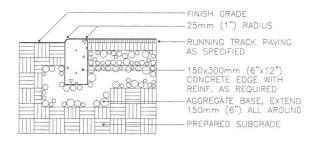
Concrete grade beam for running track. Reinforced concrete track edge restraint. Aggregate needed due to track runoff.
